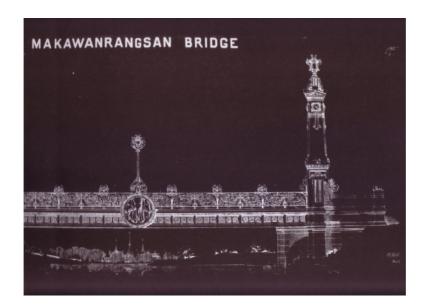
Makawan Rangsan bridge (source: Architectural drawings of historic places in Thailand, 2008)
